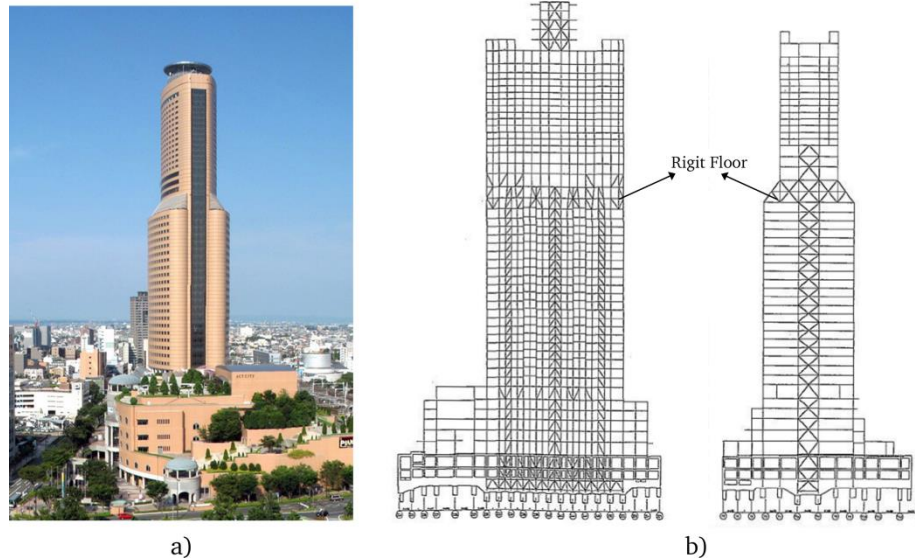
a) ACT Tower [15] b) ACT Tower's section [16]
